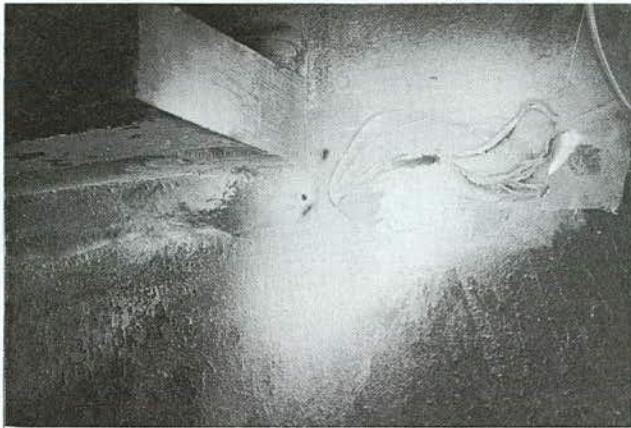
Typical fatigue crack at weld end of gusset plate, detail 7, Girder 3E.
